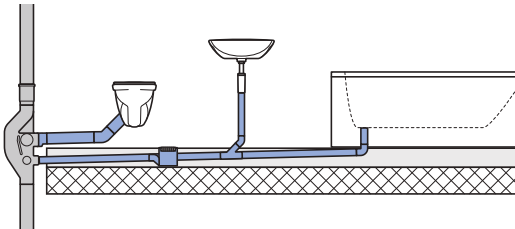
Structure with single branch discharge pipe above the screed and collector branch discharge pipe with floor drain in the screed
